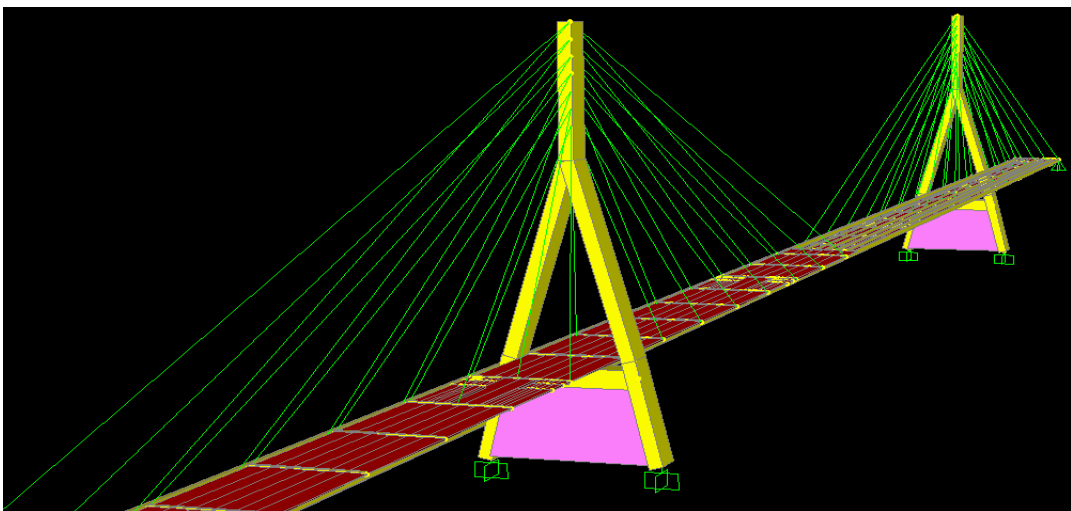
Extrude 3D view of the bridge with Y- inverted shape pylon
